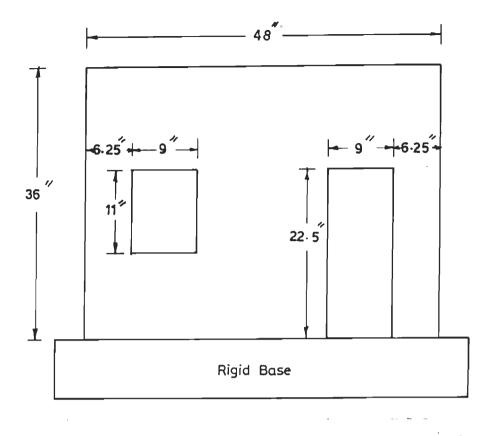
Brick Masonry Wall with Door and Window Openings
